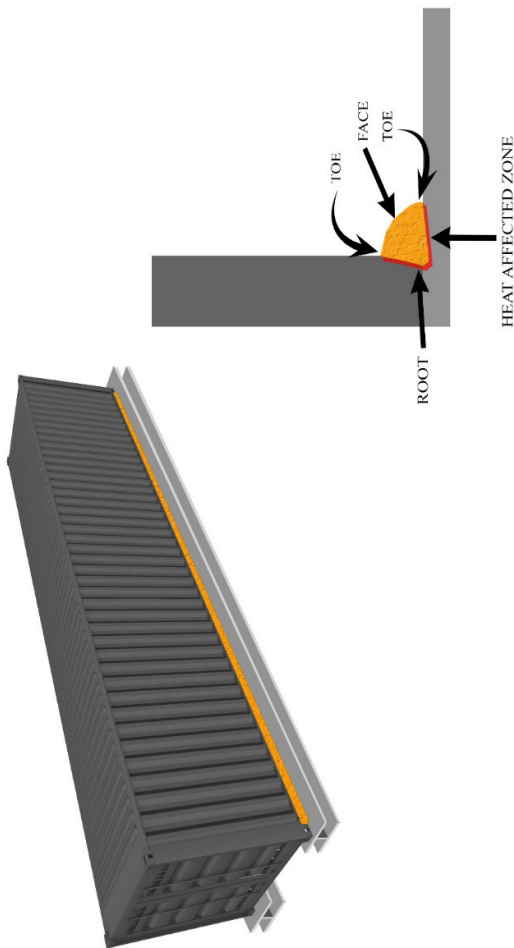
Shipping Container to Steel Member Weld Connection
